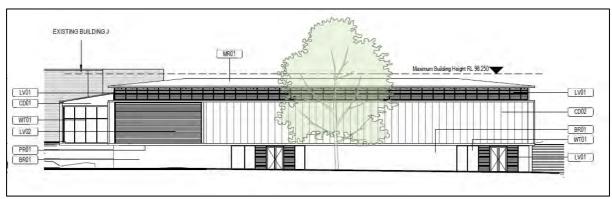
| CHS proposed Building T west elevation (Source: EIS 2020)
